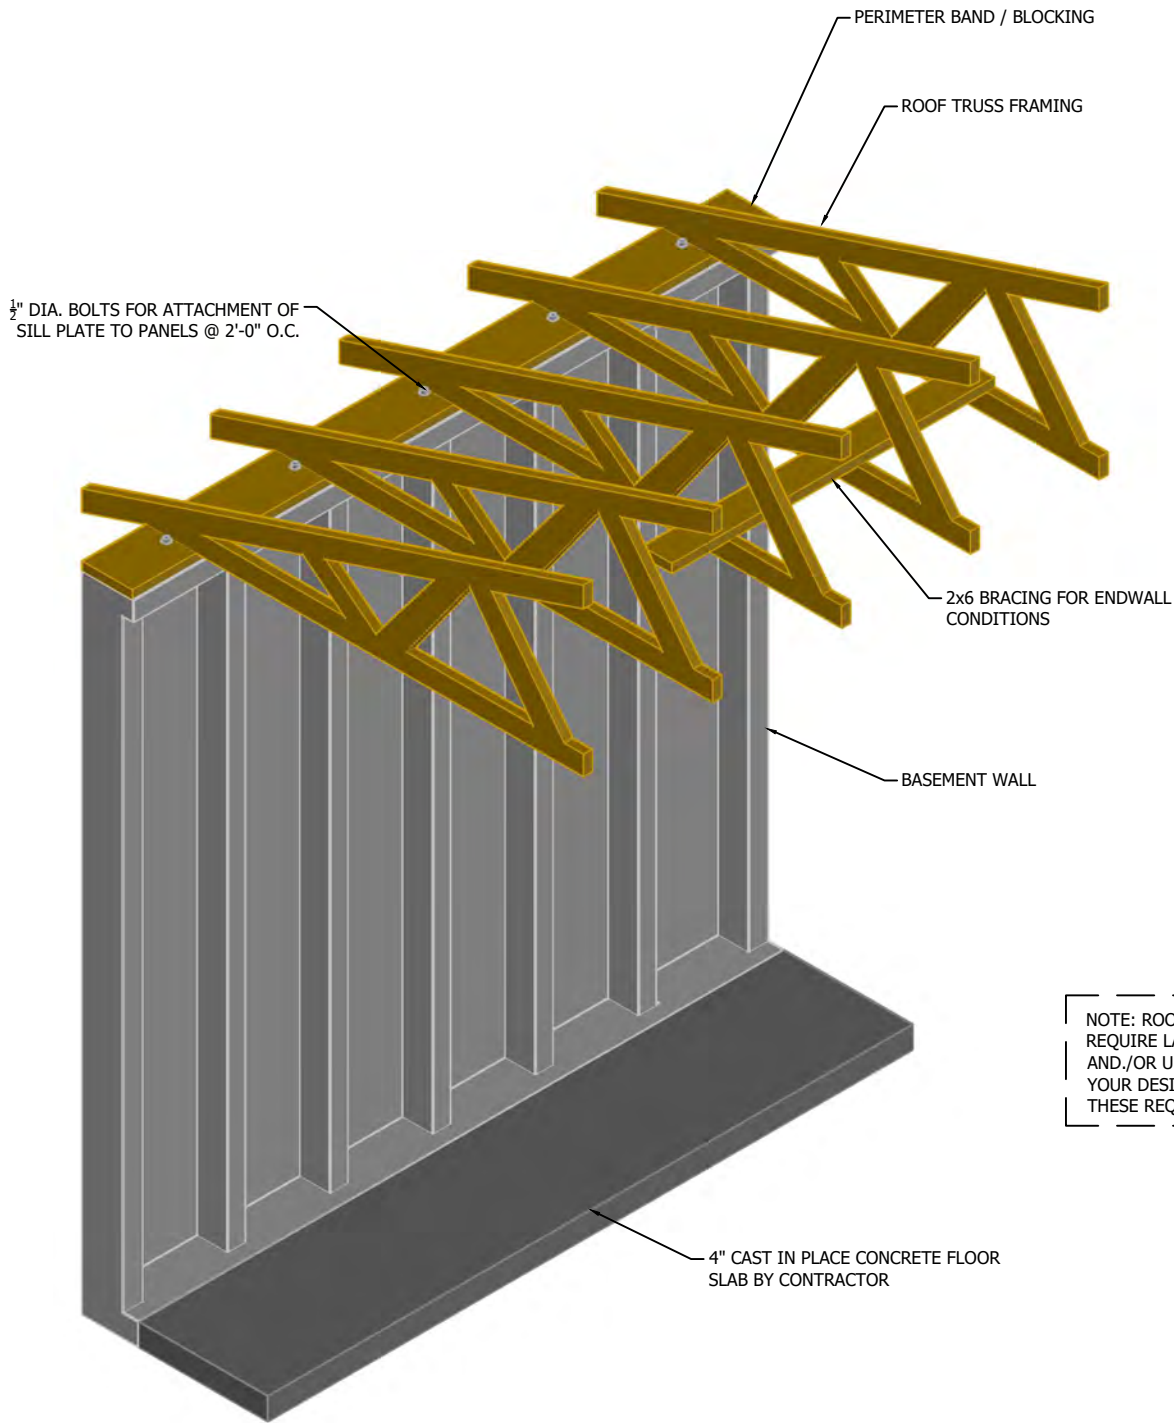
MODULAR CONSTRUCTION CONNECTION
